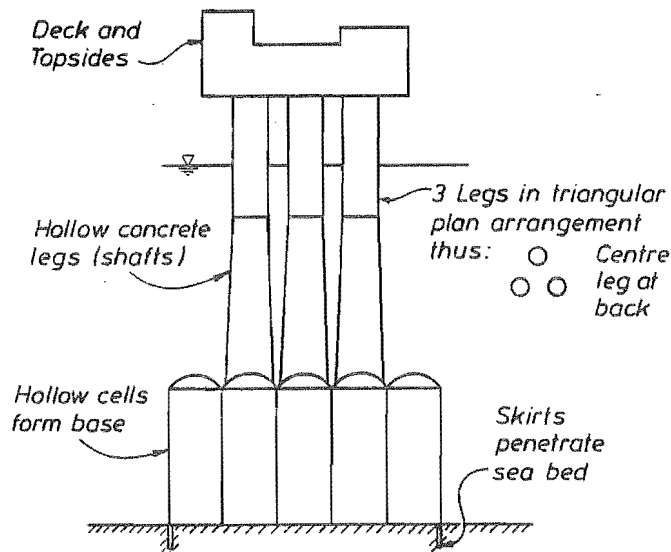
Layout of Typical North Sea Type Offshore Concrete Gravity Platform
